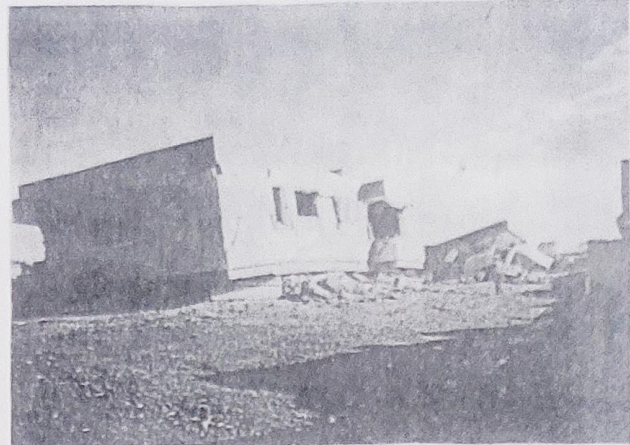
Collapsed two-story houses under construction in Boucaa Sahnoun that had soft first story
